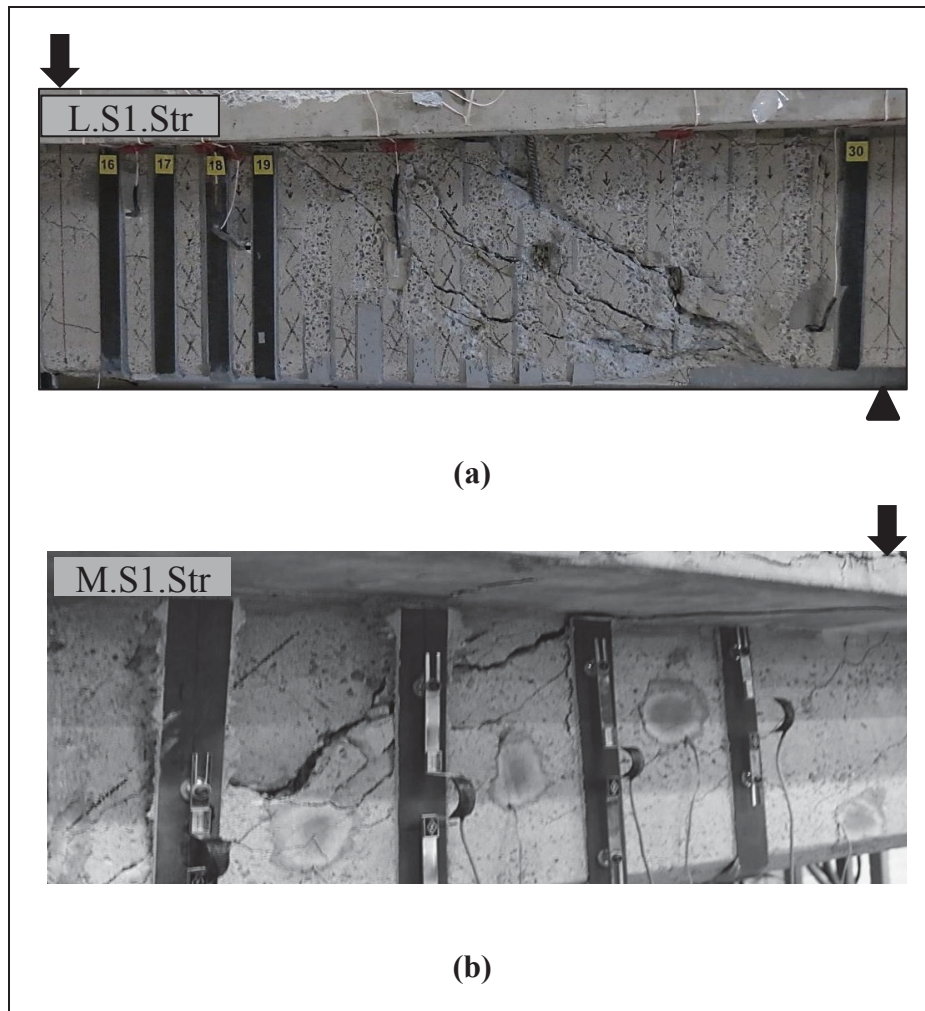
Cracking patterns for strengthened specimens without anchorage: (a) Large specimen; (b) Medium specimen
